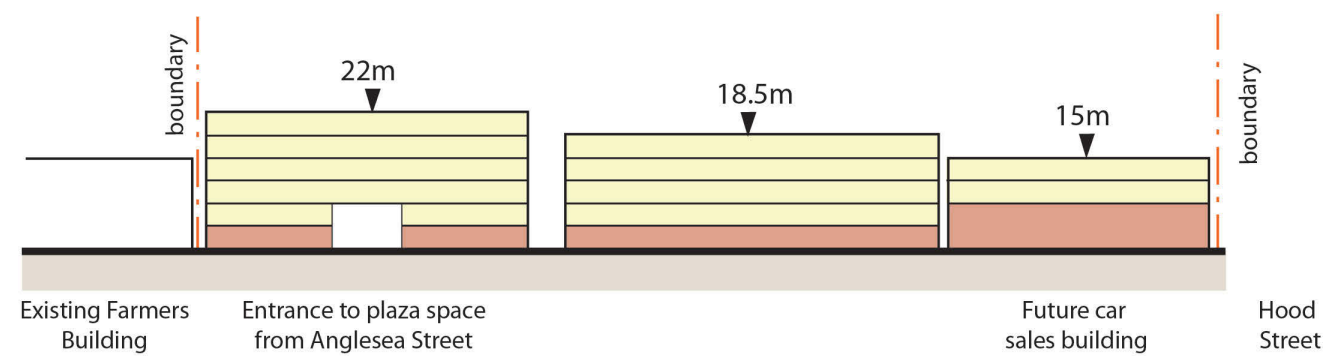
Indicative concept section B-B for Development Site 2 (not to scale)
